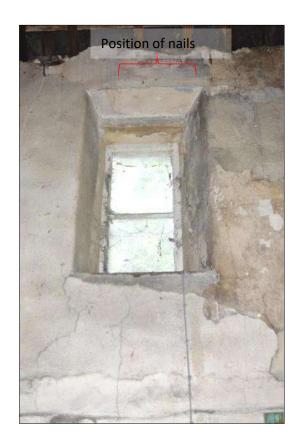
(shot 126): Close up of northwest first floor window with two protruding iron nails on the lintel, looking north-northwest
